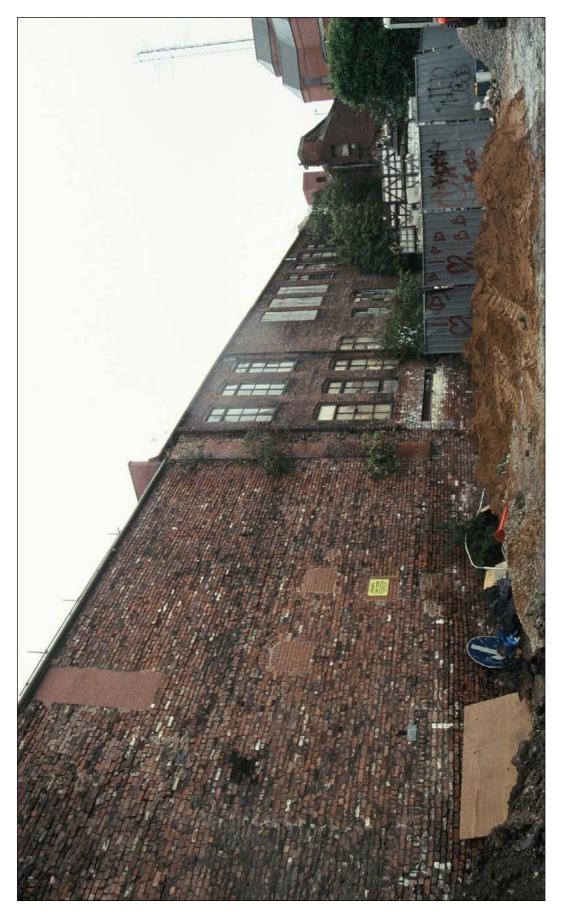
View of south elevation of the south range (west end) (film 1.13)
